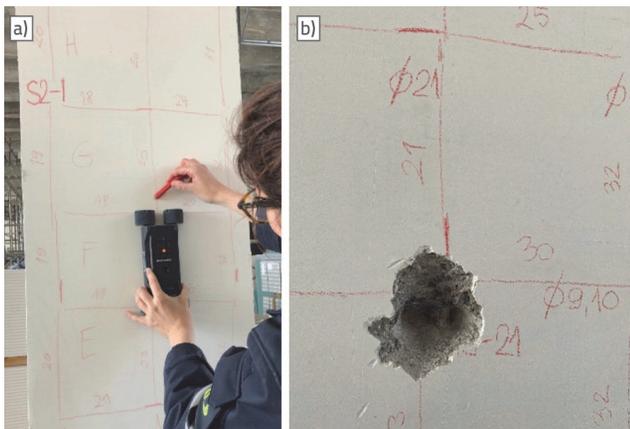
a) Locating reinforcement, determining concrete cover thickness and rebar diameter using instrument based on eddy currents; b) Confirming rebar position by opening the concrete cover [19]
